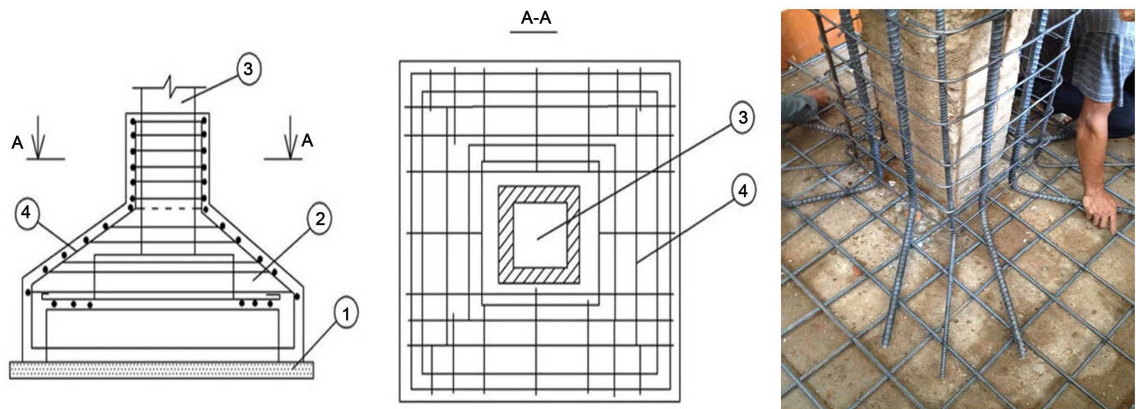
Proposal for reinforcing a single foundation by extending the foundation. In Figure 4: 1—foundation; 2—coat texture; 3—columns; 4—reinforcing steel.
